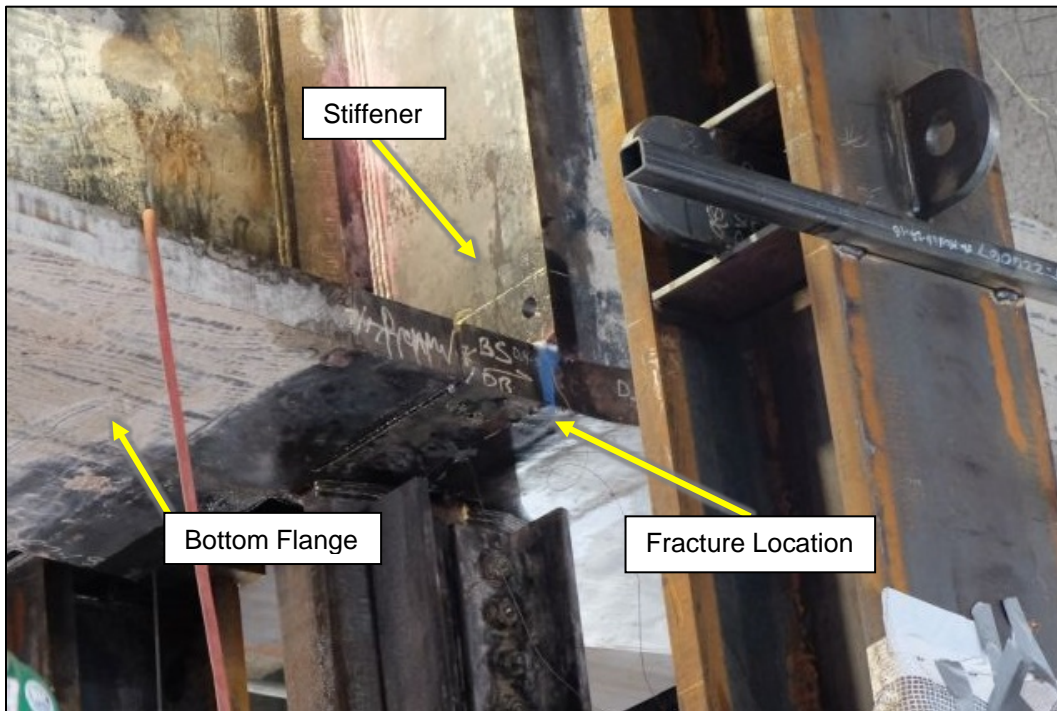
Typical location of north side girder fracture, where the fracture was protected with silicone prior to flange sample removal.
